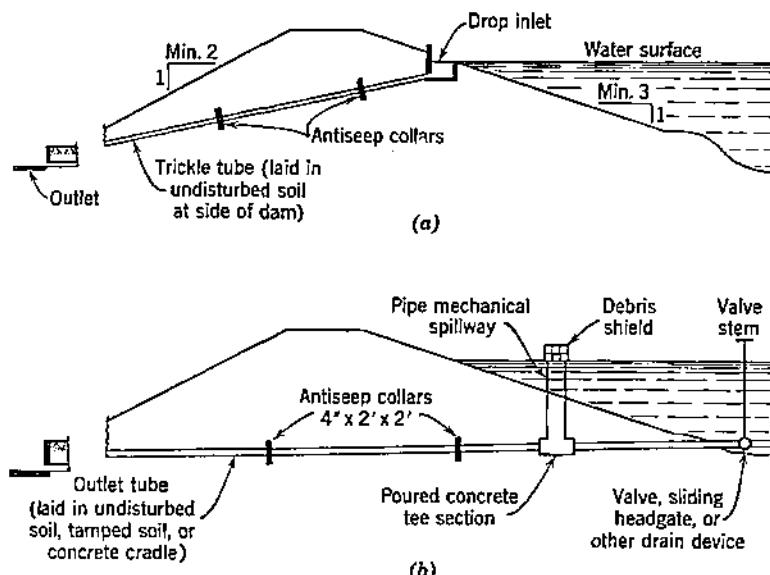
Sectional sketch of two types of mechanical spillway designs: (a) drop inlet and pipe, and (b) vertical riser and drain pipe combined. (Where the drop-inlet spillway (a) is used, the drain is constructed as in (b) less the tee and riser pipe.)
